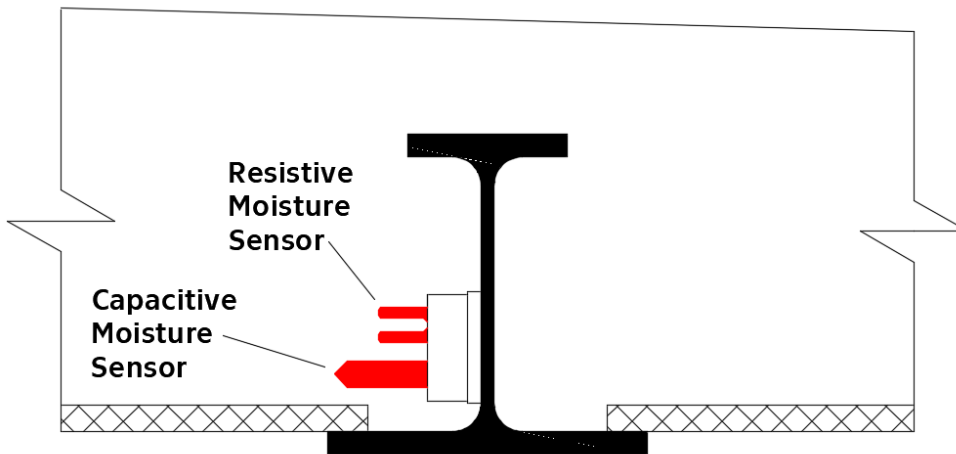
Humidity sensors deployment technique, branch box is fastened to filler beam
